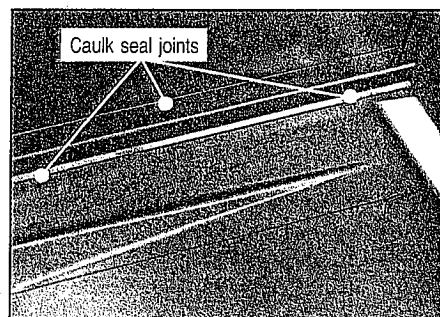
Caulk seal outside joints of wall sleeve before inserting into wall opening.
